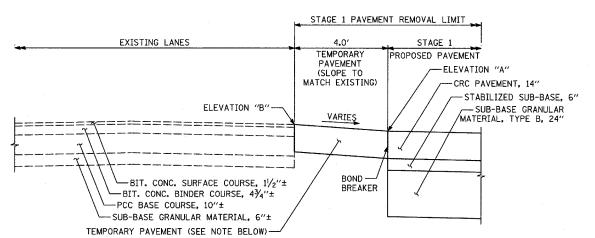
DETAIL OF MAINLINE TEMPORARY PAVEMENT FOR POST-STAGE 1 WINTER LANE CONFIGURATION
